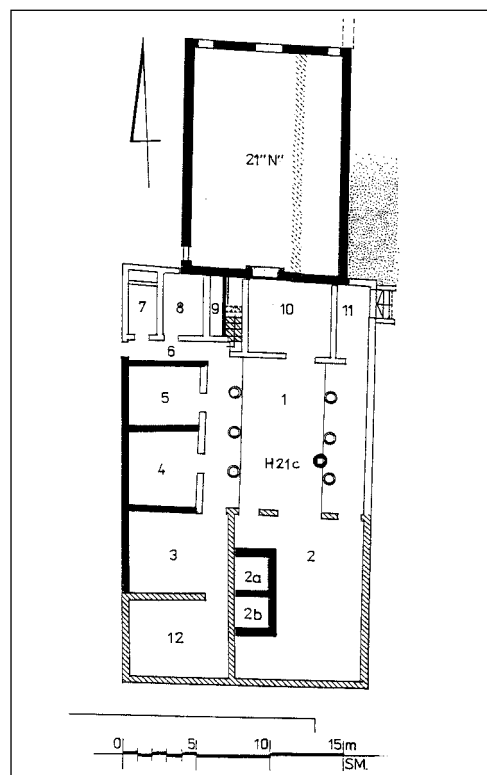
House H 21c and hall H 21"N". Schematic plan showing work completed in 2002 (in black) (Drawing S. Medeksza)
